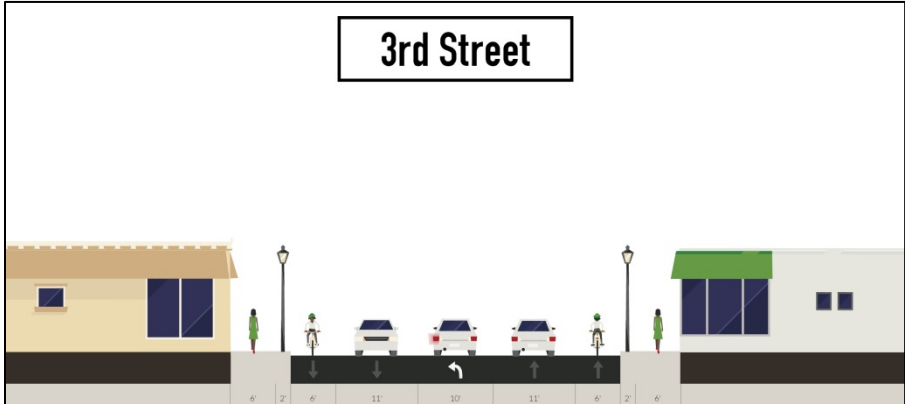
Third Street Cross-section - Alternative 2 from US 101 to Grove Avenue (60 Feet Right-of-Way)
